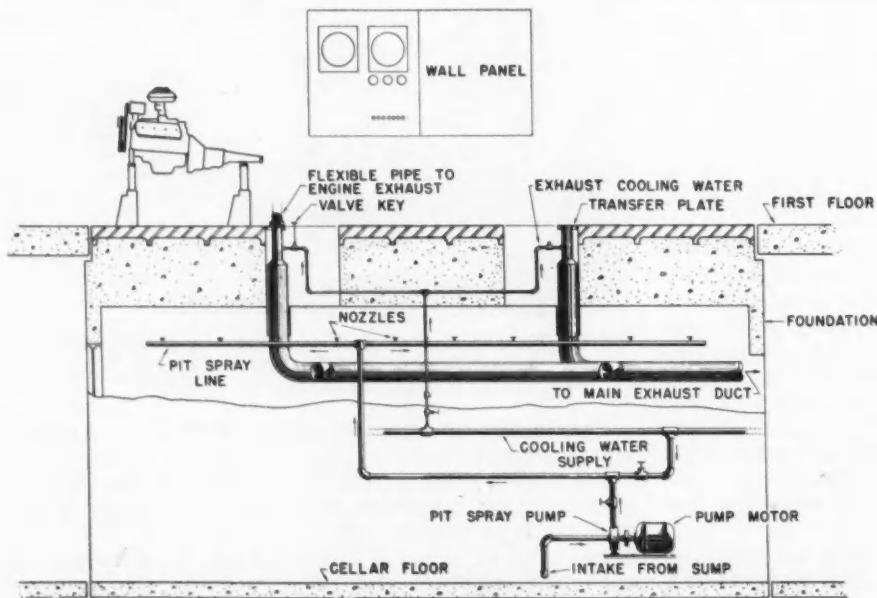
Schematic diagram of engine exhaust system. Chances of explosion are minimized by introducing a small percentage of bleed air into the blowout valve to dilute explosive mixtures
